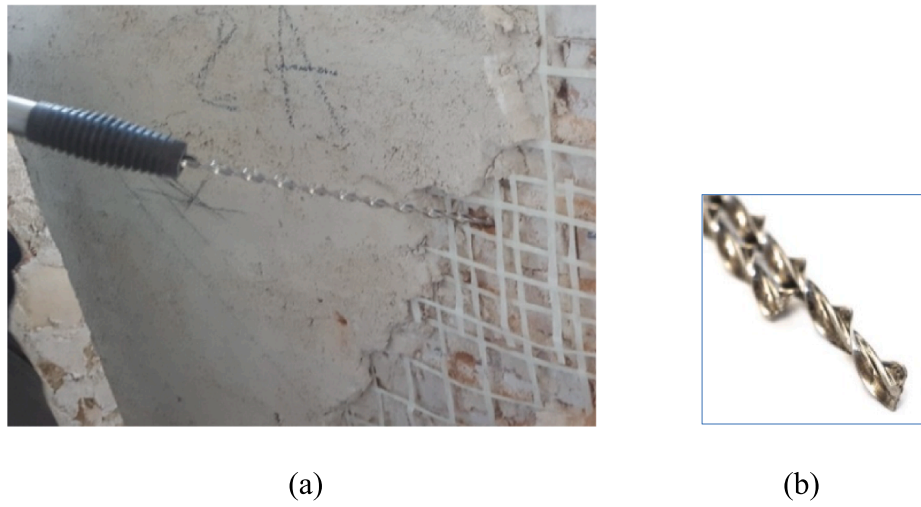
Repair of damaged walls with “dry” (no-mortar) helical rods: (a) application of the stainless steel rod into the grouted tubes, (b) Detail of the rod (10 mm outer diameter).
